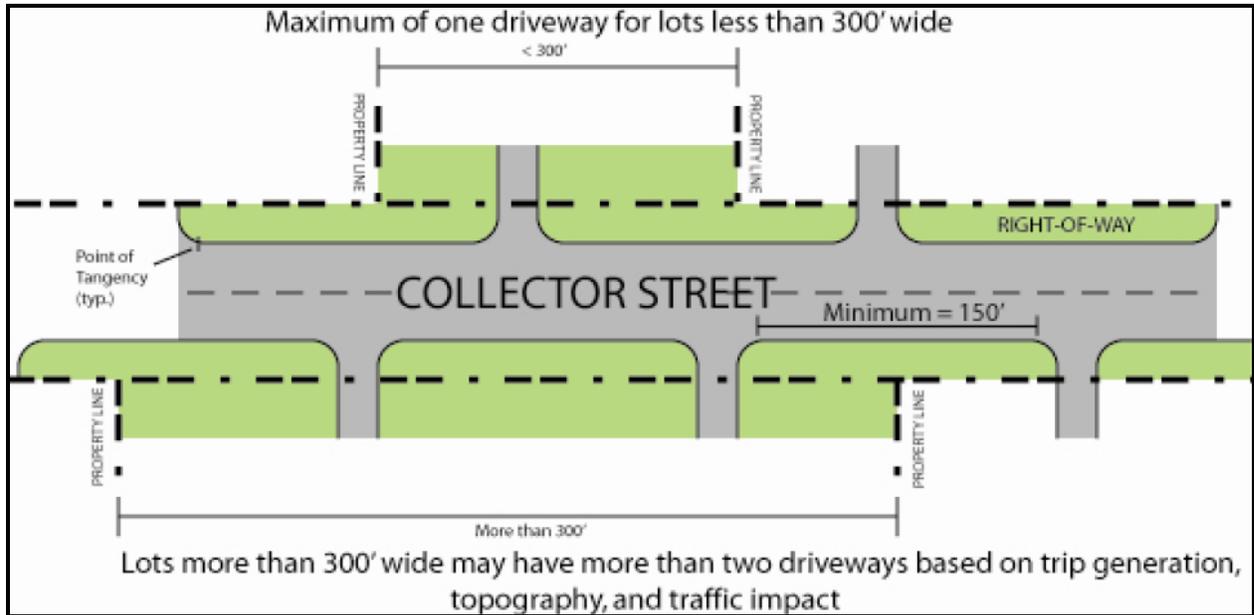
(g) – Collector Street Driveway Spacing Criteria
